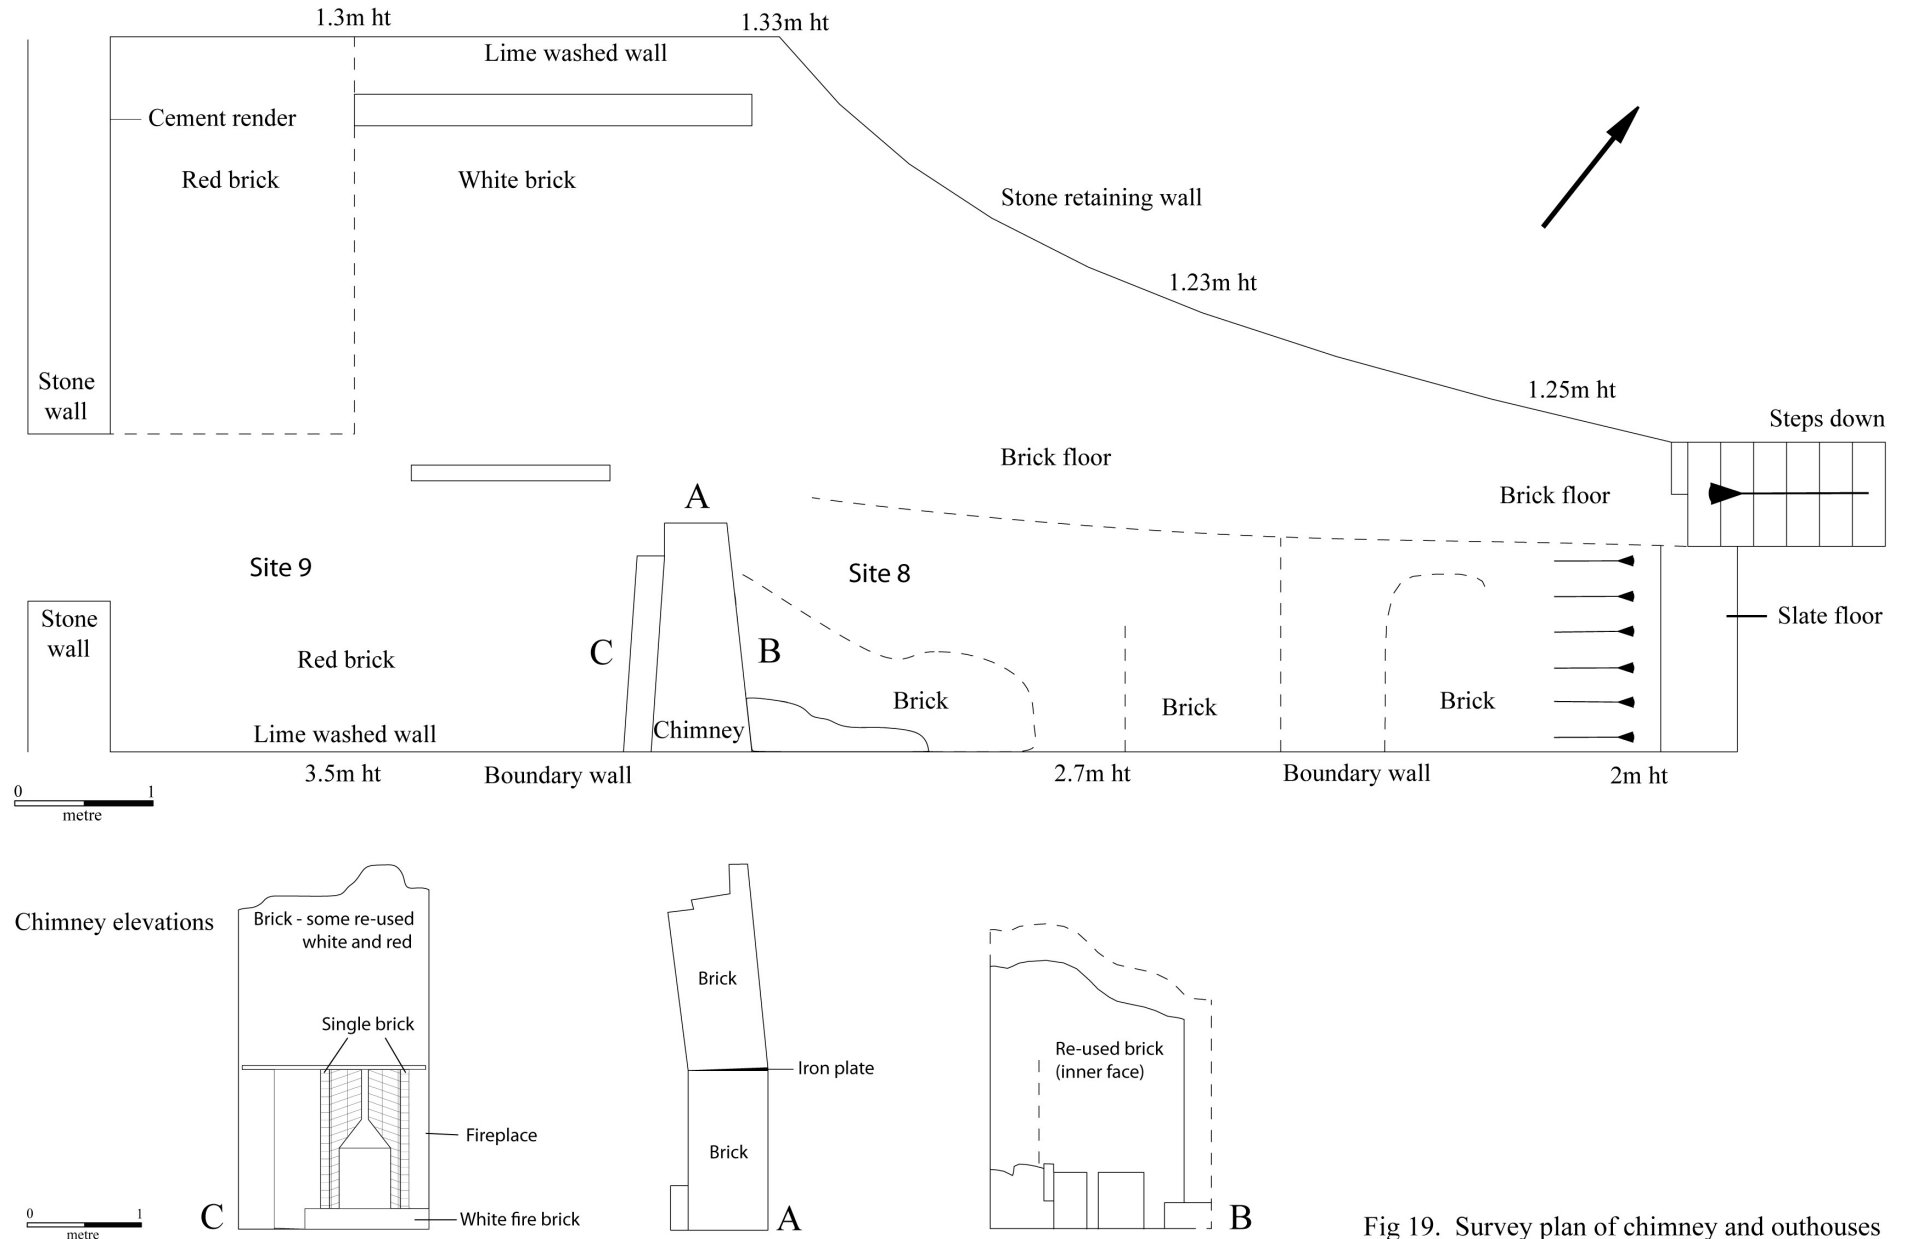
Survey plan of chimney and outhouses with plan and elevations of fireplace (sites 8 & 9).
